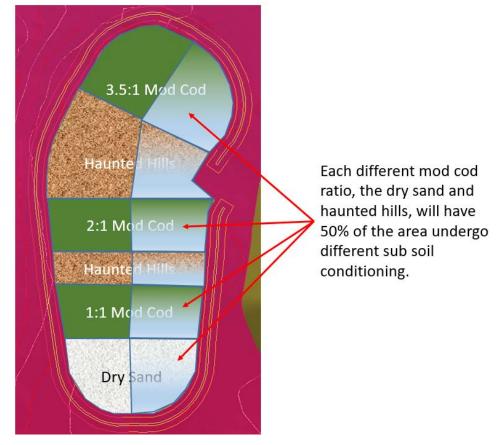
Pit void plan view showing the various manufactured subsoil zones.
